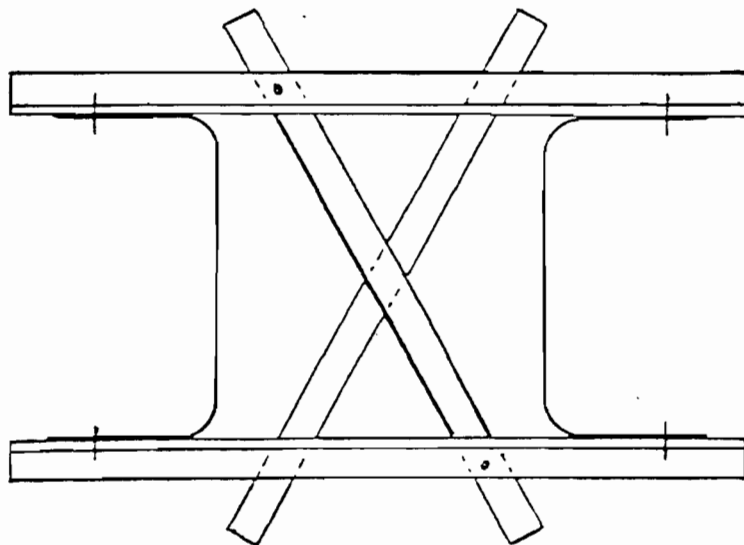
Configuration of Beam Test Specimens for Members with Unstiffened Compression Flanges
